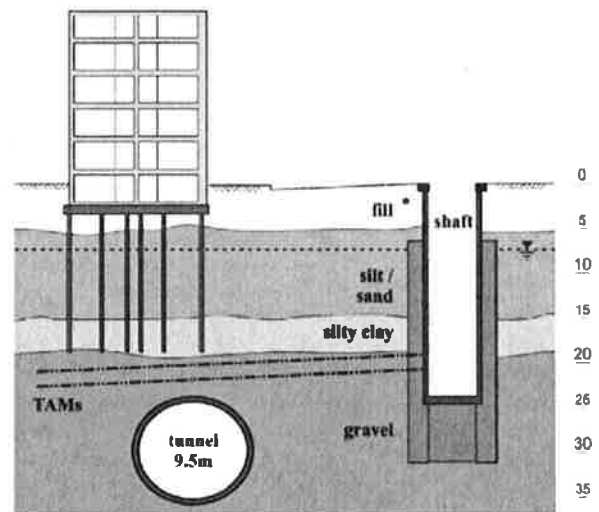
Schematic cross section for TAM installation close to a piled foundation at ‘Ionio Station’ (after Kummerer and Sciotti).
